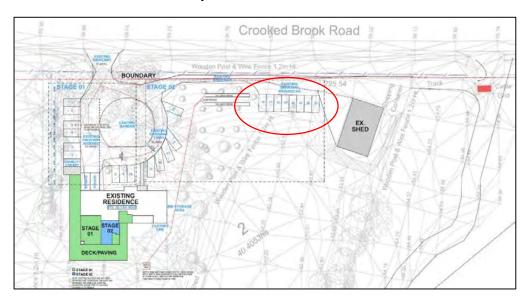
Typical Parking Arrangement, additional bays for stage 2.
